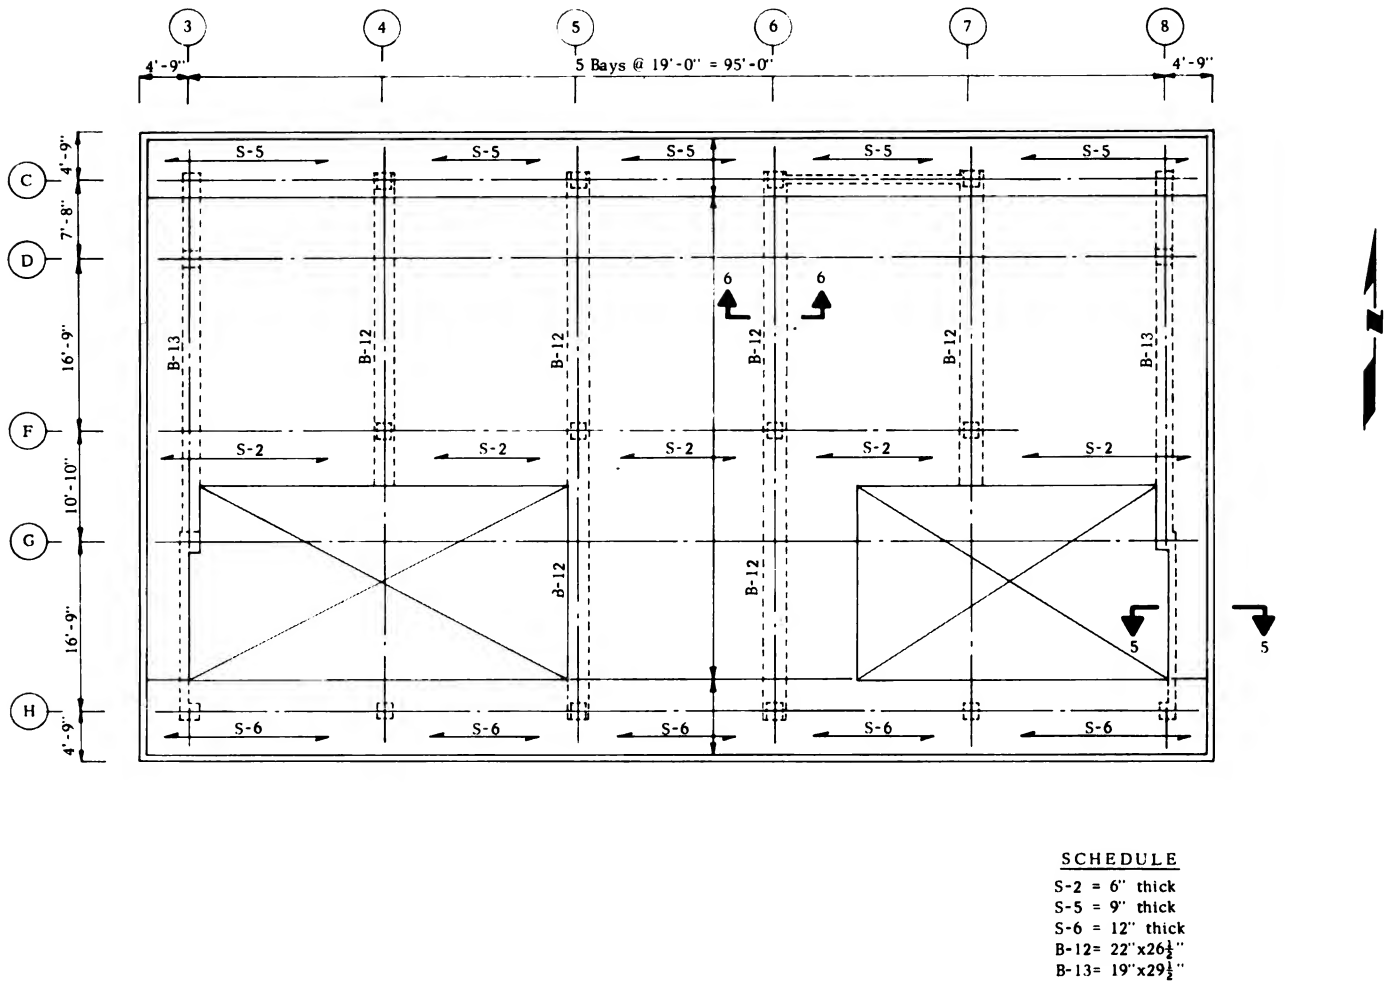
Indian Hills Medical Center. Penthouse roof framing plan.
